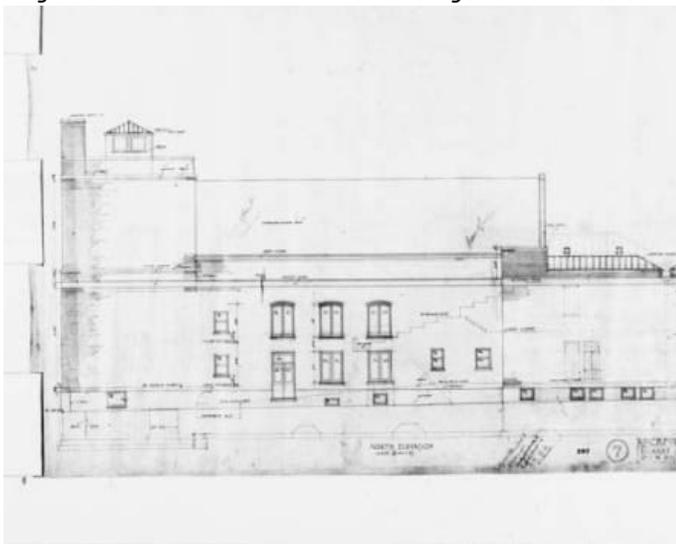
Historic Tallmadge and Watson Architectural Plan; North Elevation
